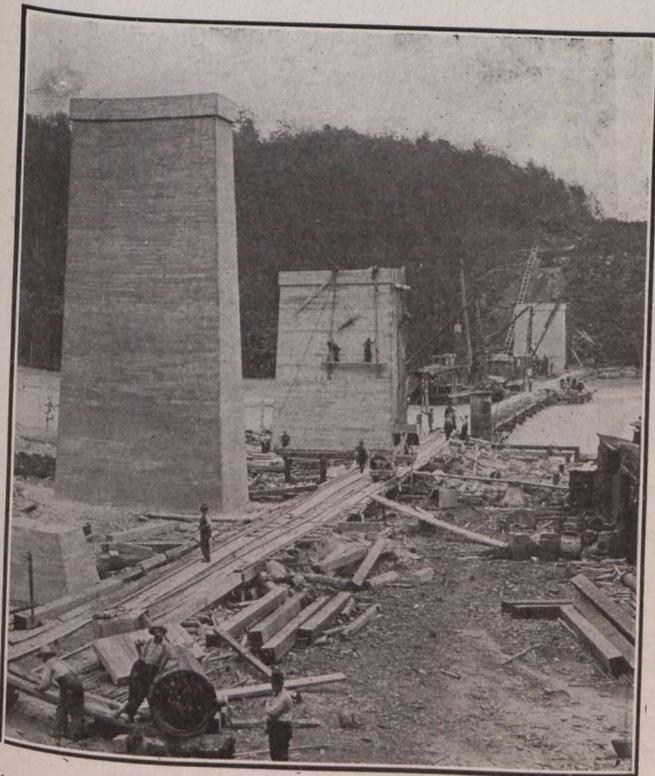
General View, Showing Piers No. 1, No. 3 and No. 4 Completed.
